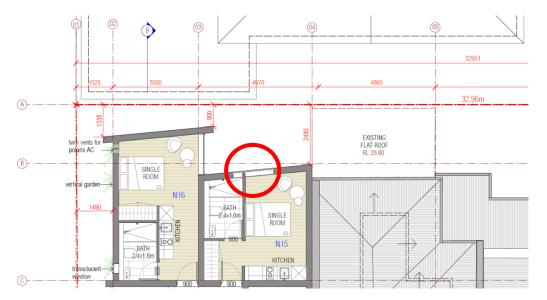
Plan drawing extract of boarding room N15 at level 4 and the adjacent 'Clanricarde' building at 15 Billyard Avenue, Elizabeth Bay, with the subject window circled in red
